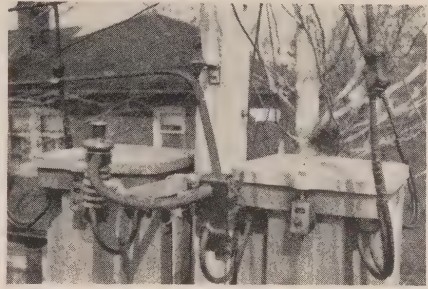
Method of connecting two transformer primaries using a transformer cutout.
